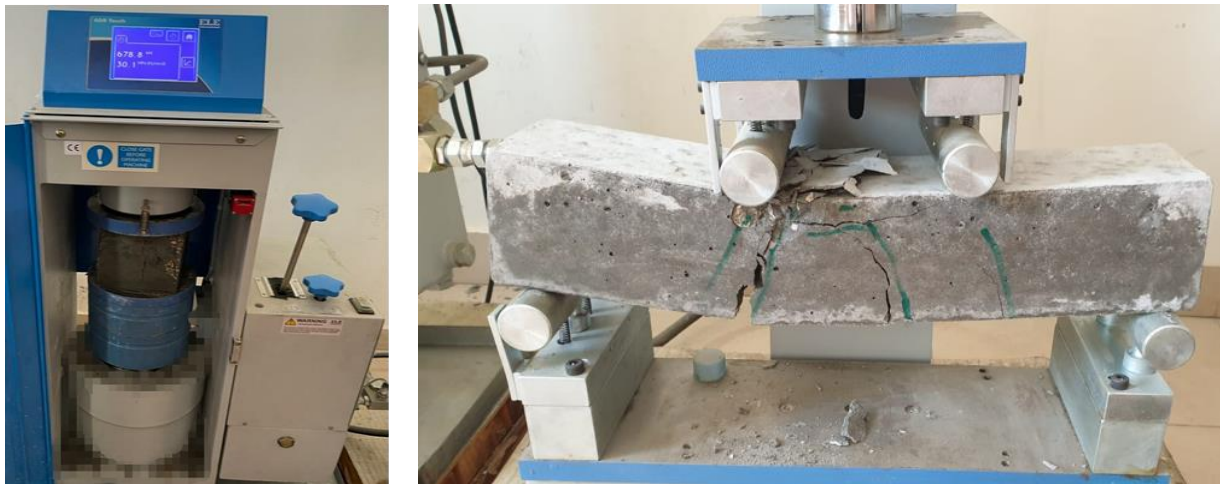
Sample Screening Device of Concrete and Reinforcement Concrete in Compression and Bending
